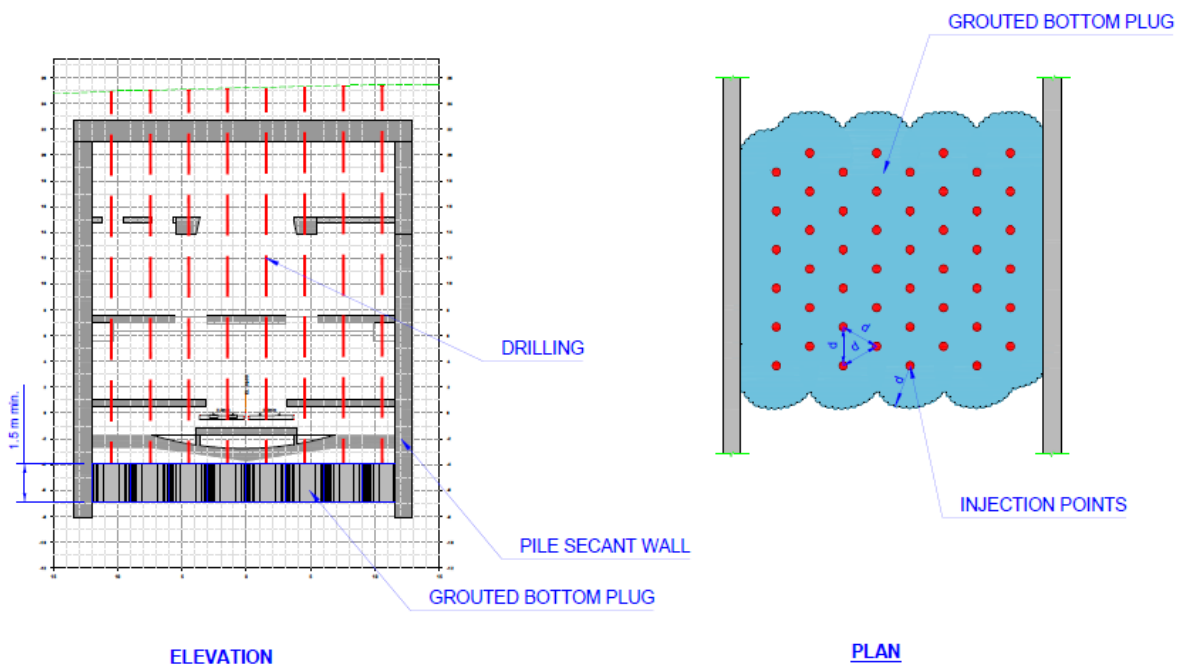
Scheme type of grouted excavation bottom plug in Cut&Cover sections
